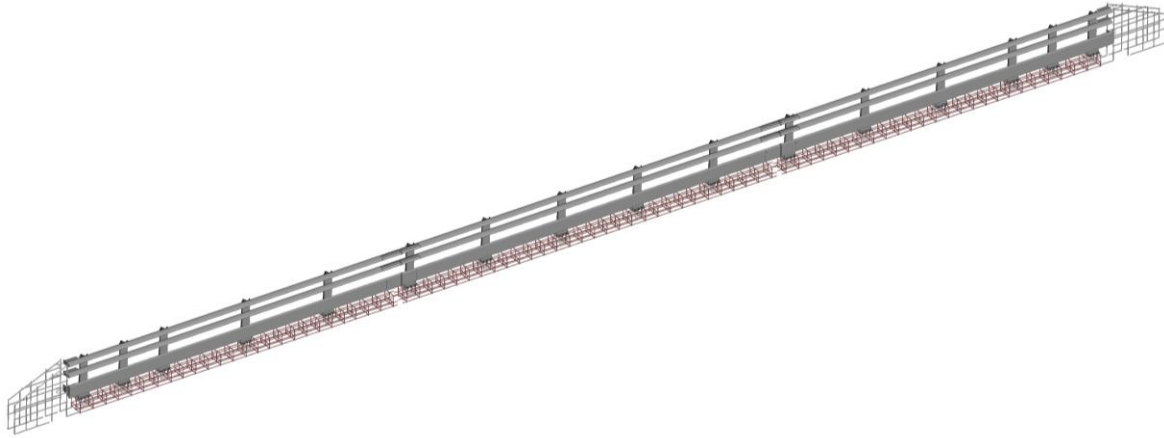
Steel reinforcement bars inside the concrete foundation of the 3BMR.
